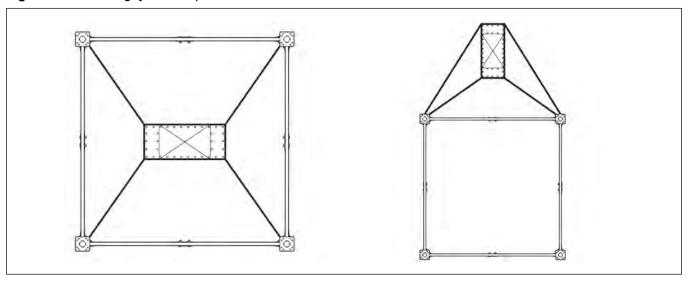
Elevator guy bracket attachment – shear plate locations
